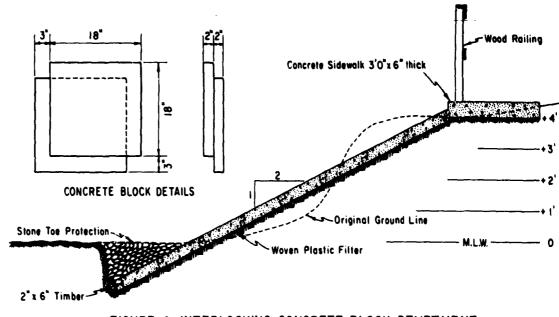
INTERLOCKING CONCRETE BLOCK REVETMENT
